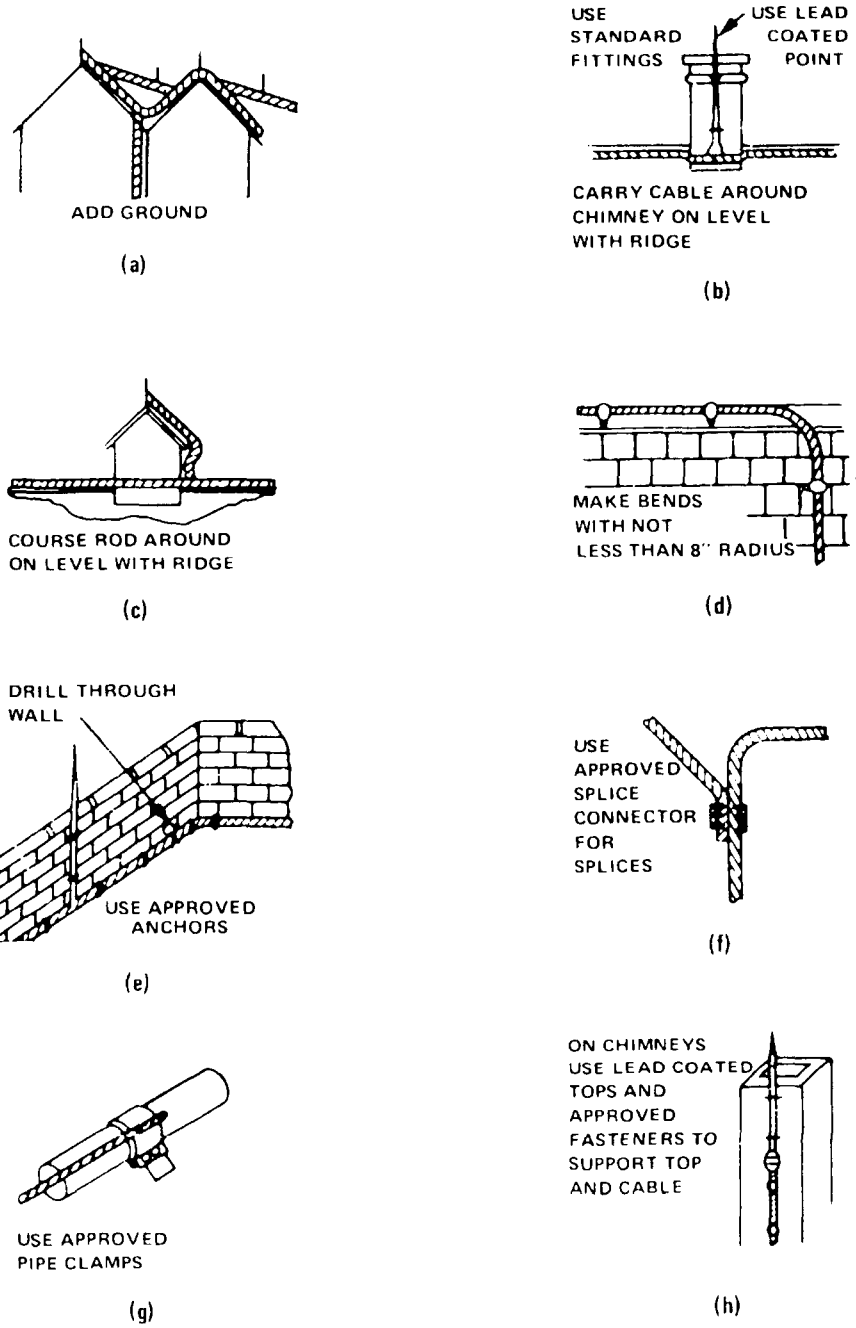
Recommended Construction Practices for Integral Lightning Protection Systems
